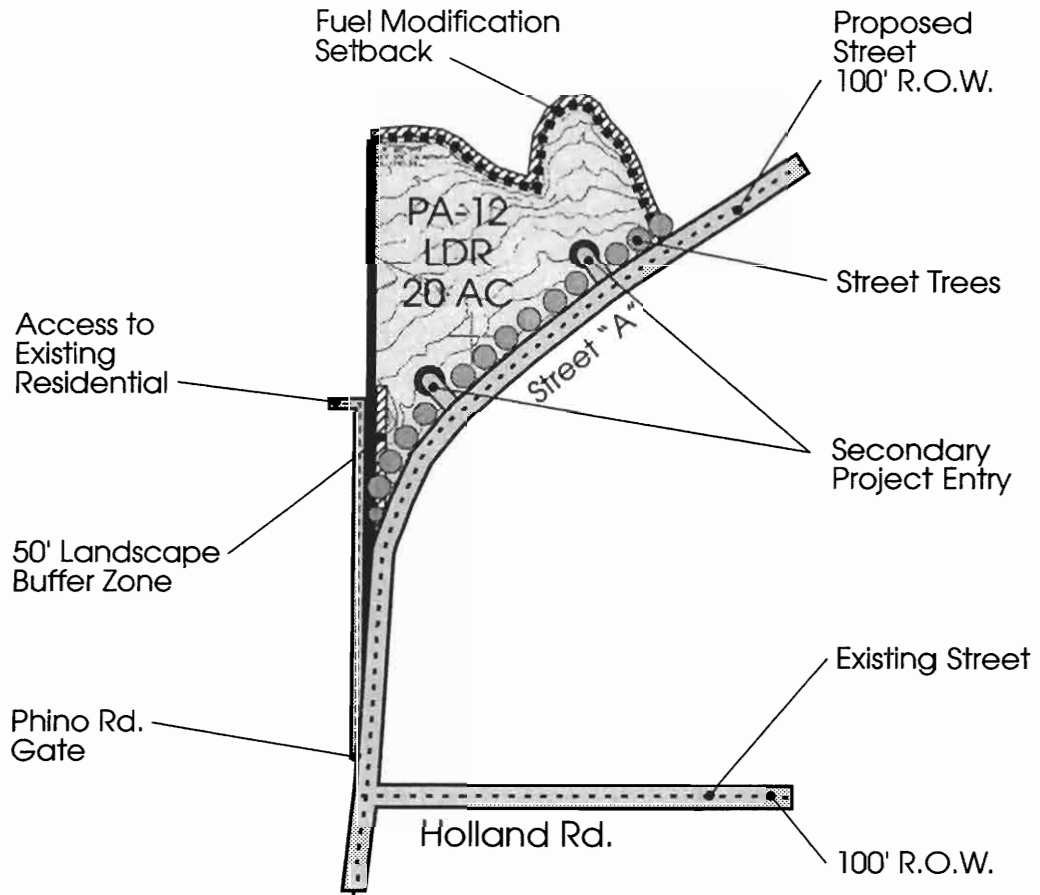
shows Planning Area 12 and its relationship to roads and adjacent planning areas. As shown, access to the planning area will be taken from and “A” Street. Cross access between PA 12 and existing residential uses to the west shall be maintained.
